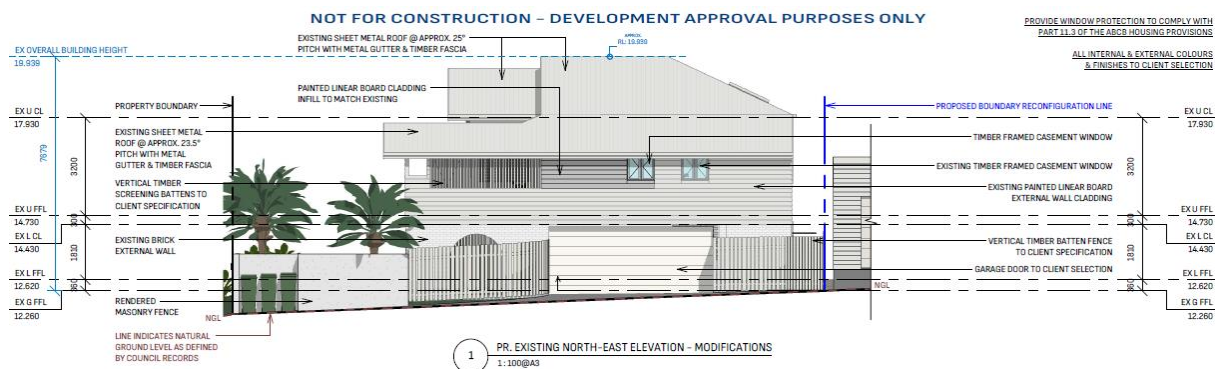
Proposed Front Elevation (Existing dwelling)
